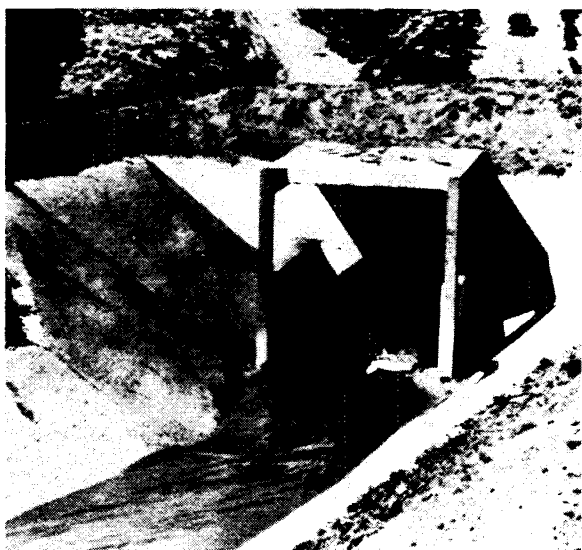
Check inlet to 42-inch-diameter pipe siphon. P 222-116-48458
